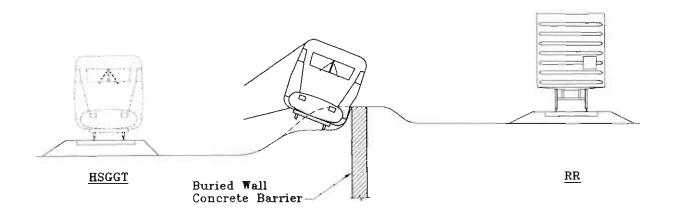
COMBINATION BARRIER - BURIED CONCRETE WALL
